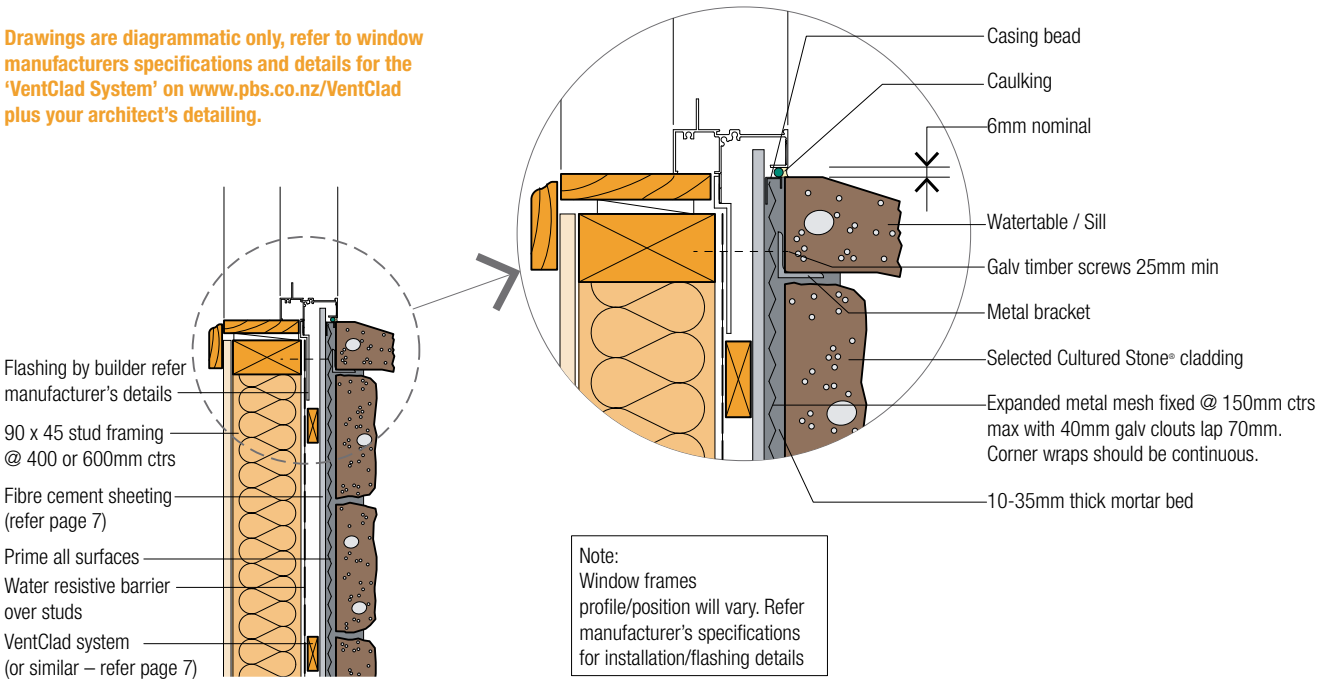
Sill at Window - Section (Dwg # CS-06.04)
